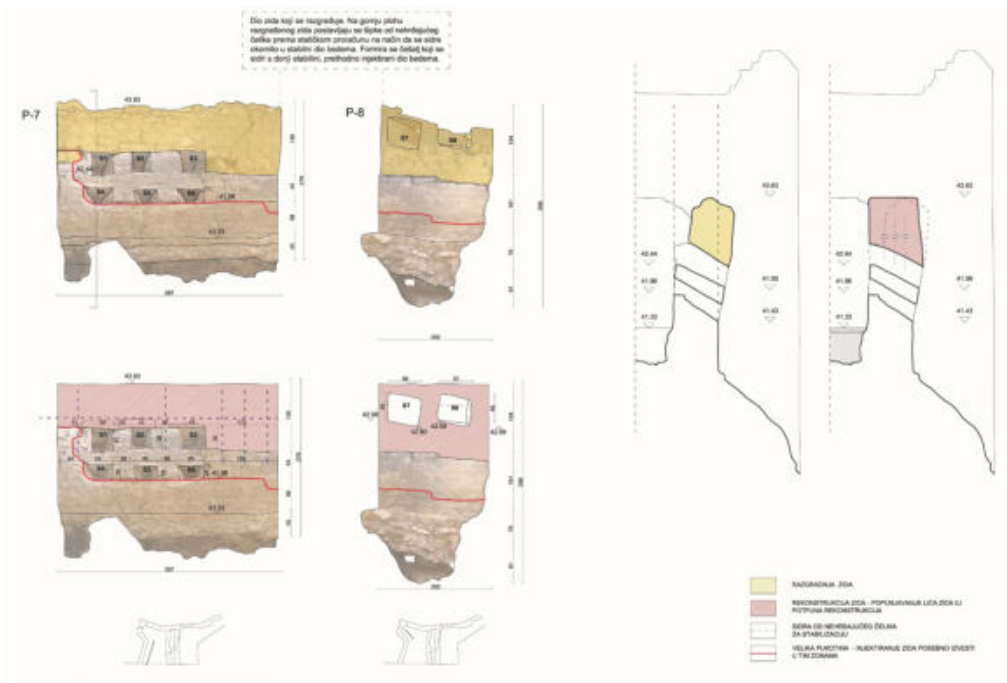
The planned intervention on the western wall, part of the restoration project (March d.o.o., 2019)
